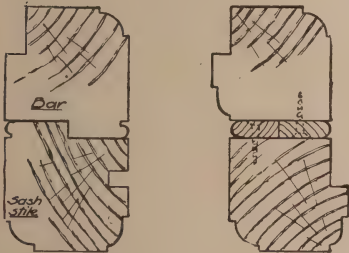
Two Constructions of Sliding Bar and Stile of Yorkshire Light
